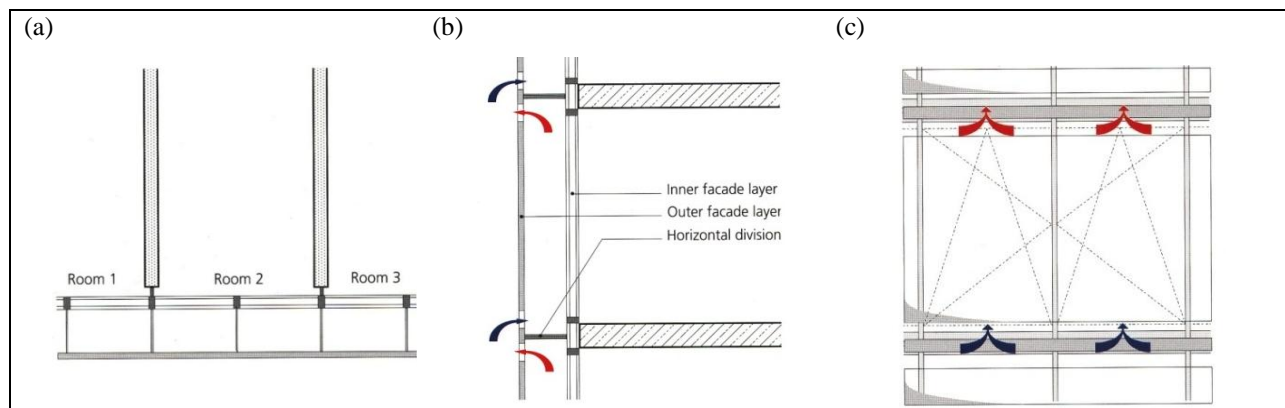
Box-window type: Plan (a); section (b); elevation(c) (Osterle, 2001)
